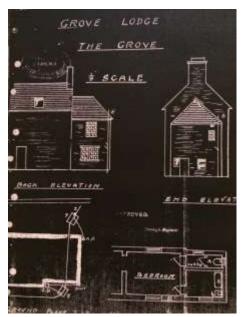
1923 plan and elevation of new southern extension for John Galsworthy.
